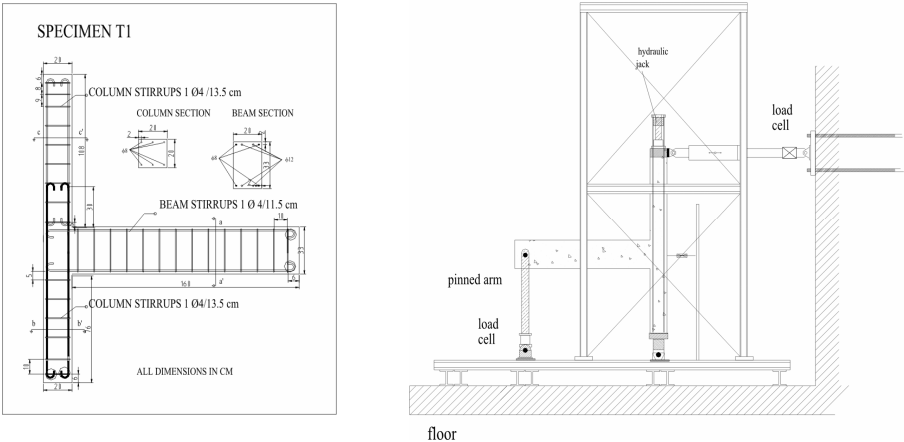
Exterior beam-column joint specimen T1 and test set-up (Pampanin et al. 2002).
